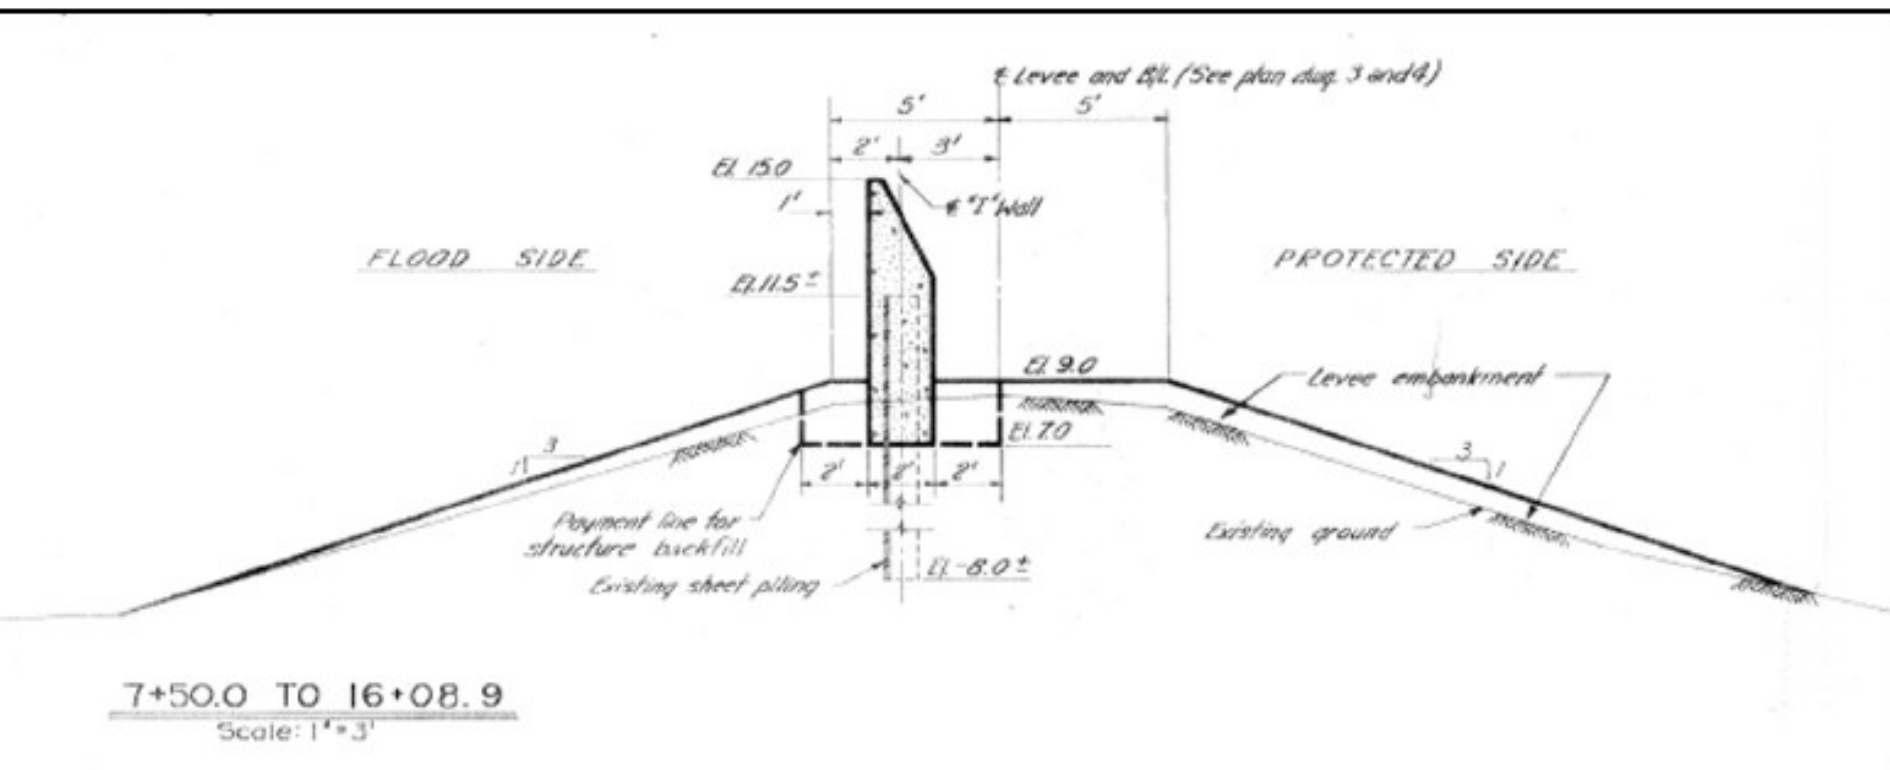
Existing Levee and I-Wall Drawing for IHNC East. Note that scoured soil included the "structure backfill" zone (from drawing file H-4-25157, IHNC East Levee from Lock to Florida Ave. Floodwall, sheet 12 of 15)
